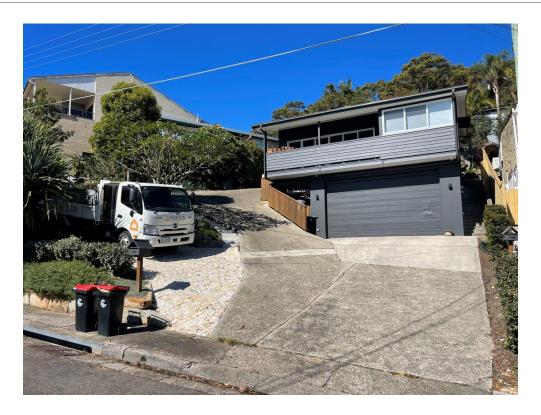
View of the subject site (existing secondary dwelling in foreground) with driveway access to rear parking area for dwelling, looking south-west from Elanora Road
